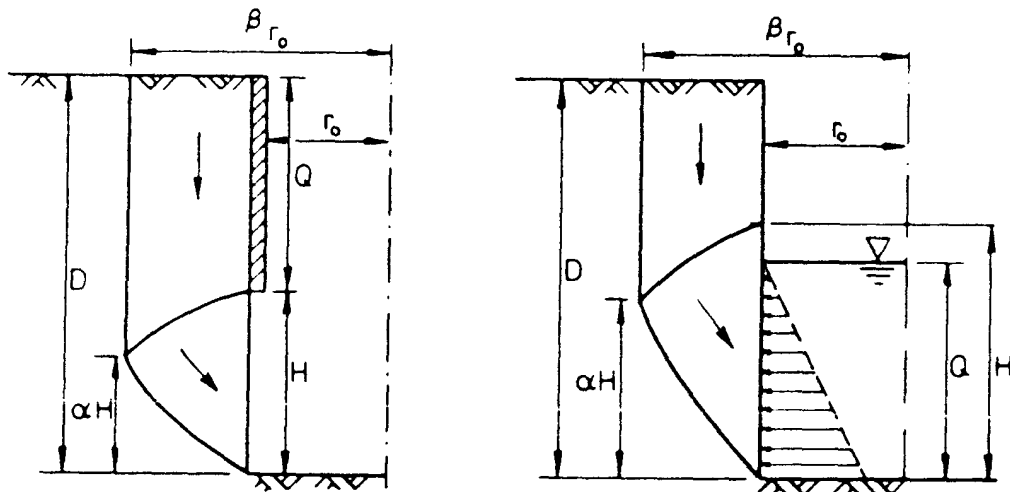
Wall failure mechanisms for support axisymmetric excavations (Britto and Kusakabe, 1984)
